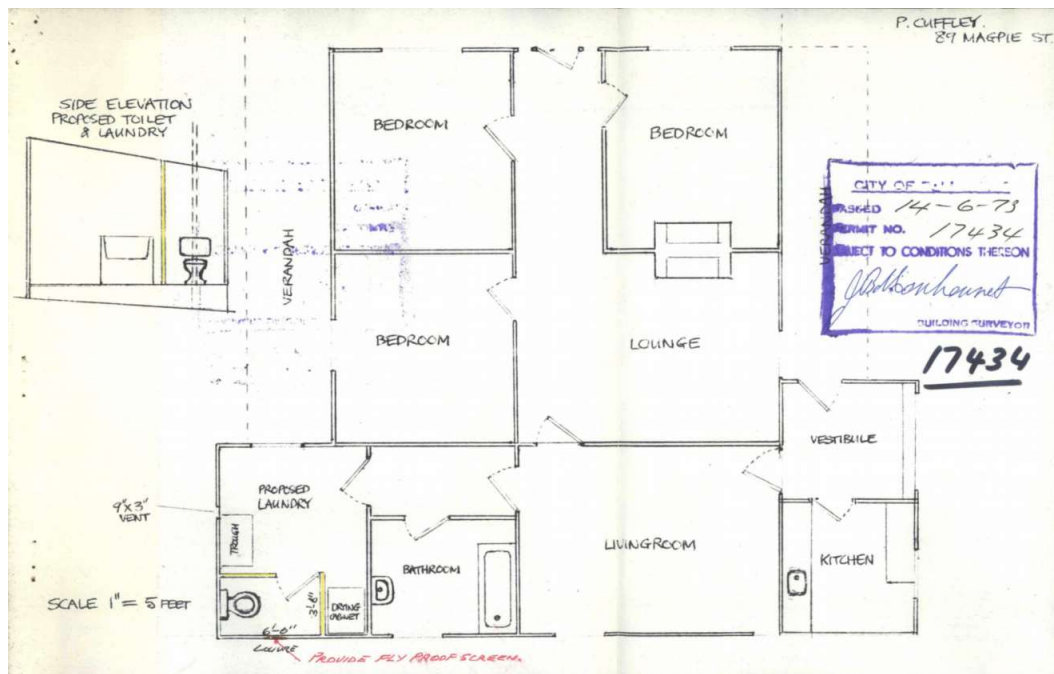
Floor plan of the house in 1973, showing internal alterations to create a WC. Note that while this plan omits the bay window on the south-west elevation, but it was already in existence as shown by the c1972 photo above. (Source: City of Ballarat, BP No. 17434)
